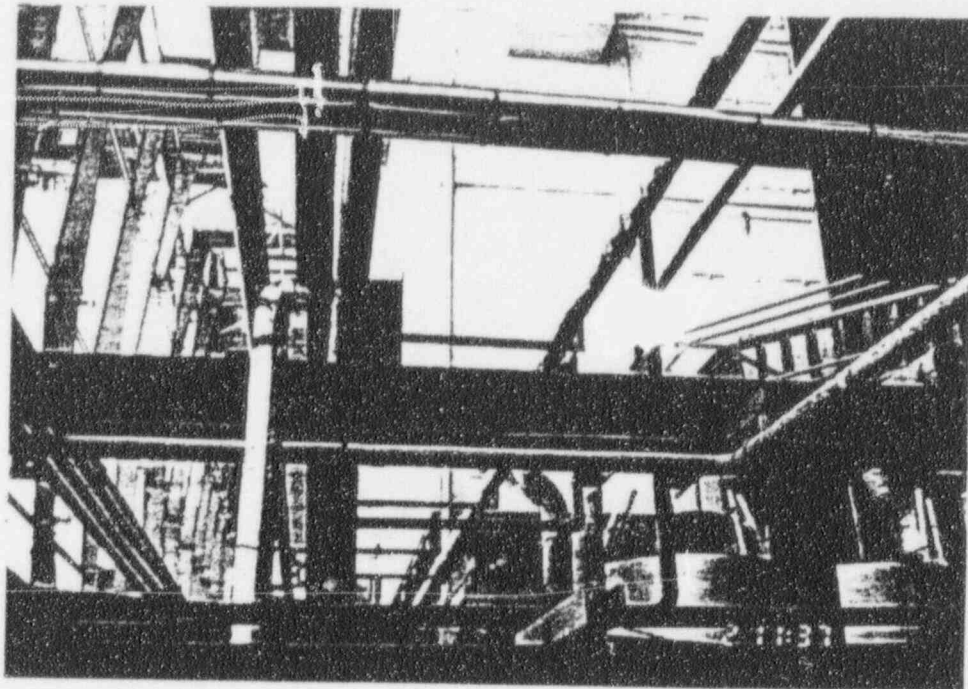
Typical structural steel section pipe supports found in Cool Water Units 3 & 4.
